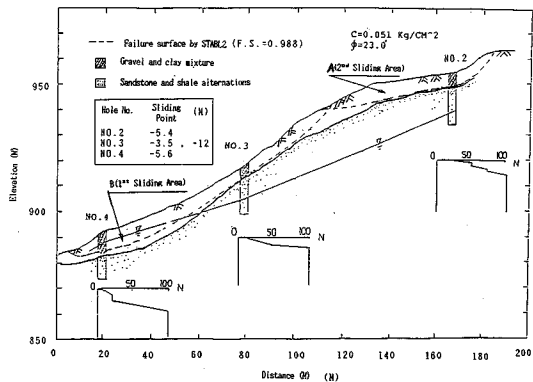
Stratum section and sliding surface of the Er-Jen Mountain.
